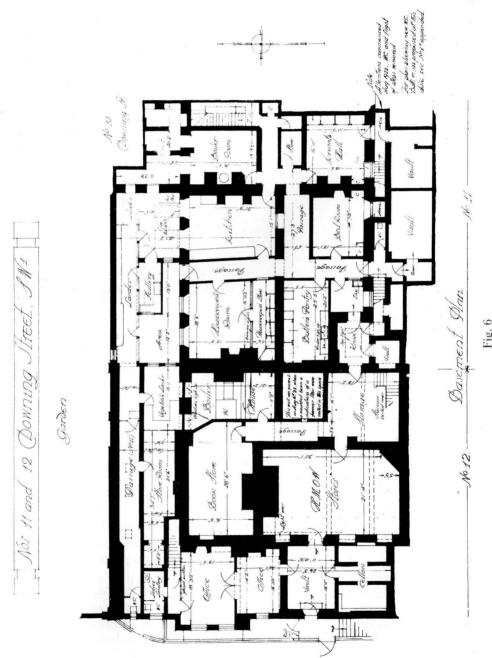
11 and 12 Downing Street: Basement Plan, 1922 (London, English Heritage)
